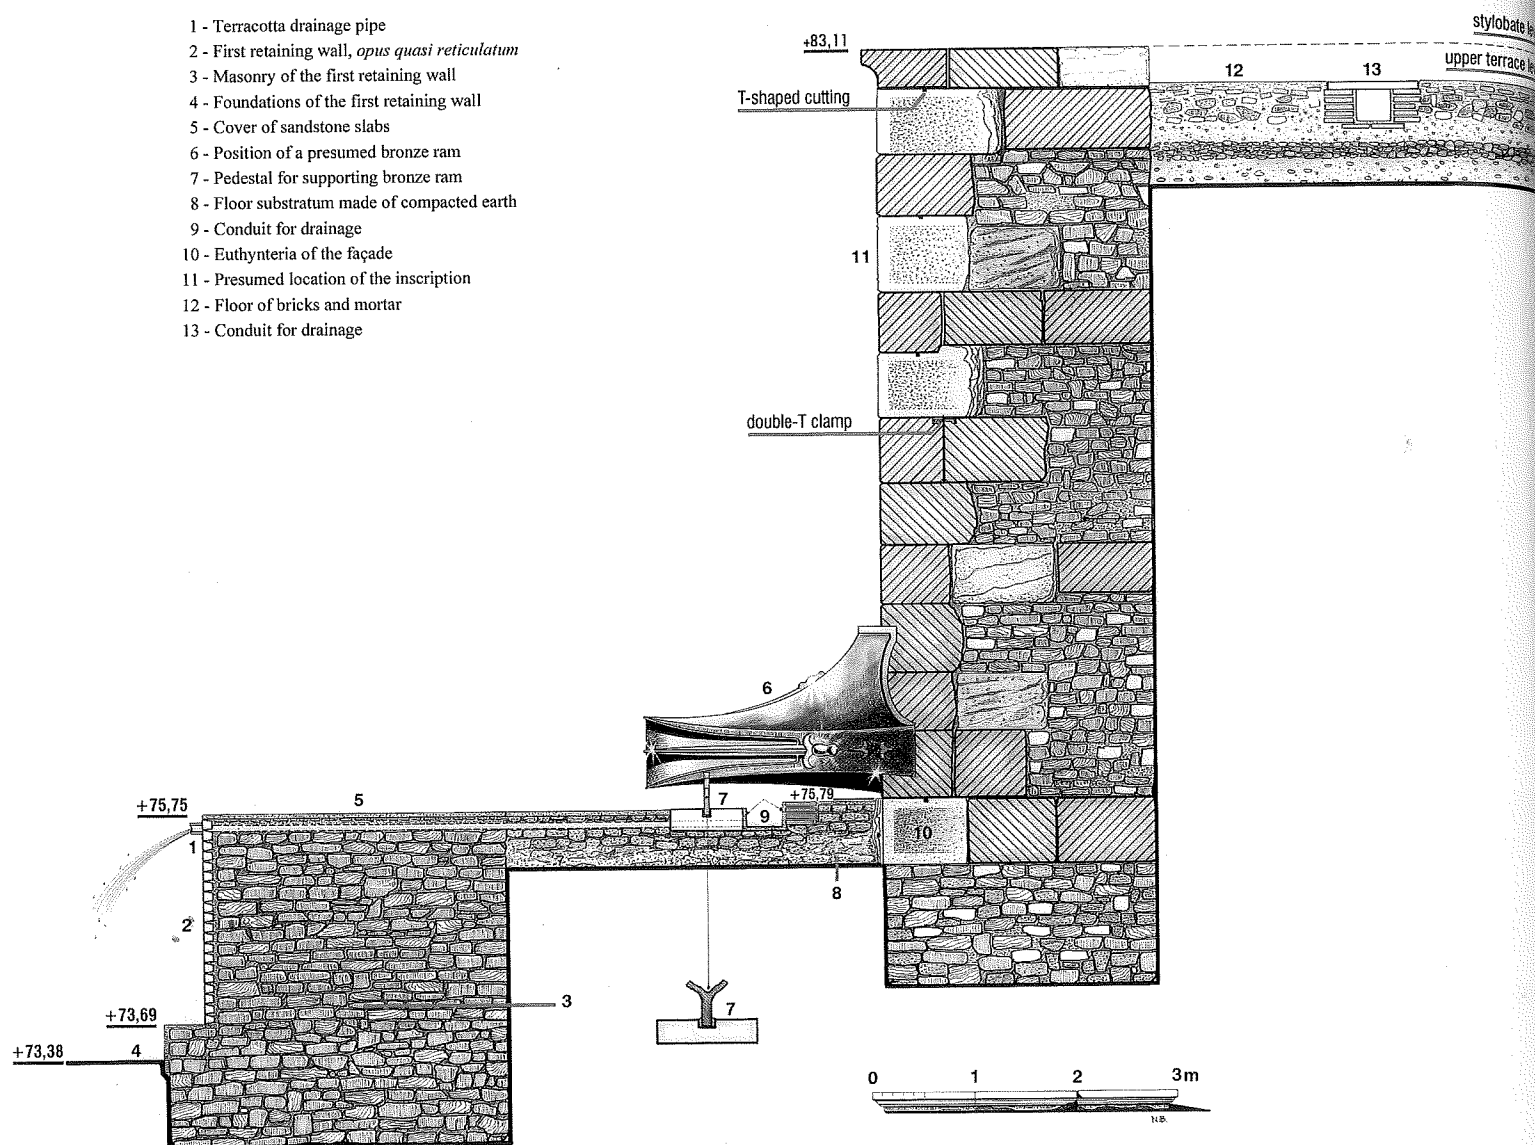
Provisional reconstruction of a section of the S part of the monument, showing retaining walls, façade, conduits for drains, and placement of bronze rams.
